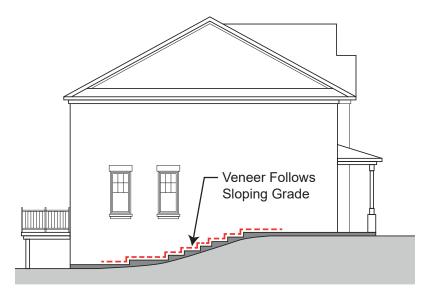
Veneer should be stepped to follow sloping grade to limit exposure of the foundation wall
